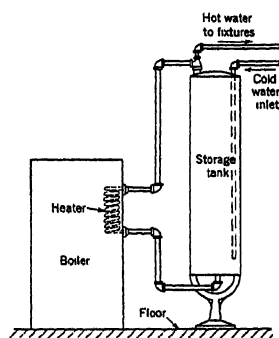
INDIRECT WATER HEATER PLACED IN BOILER
